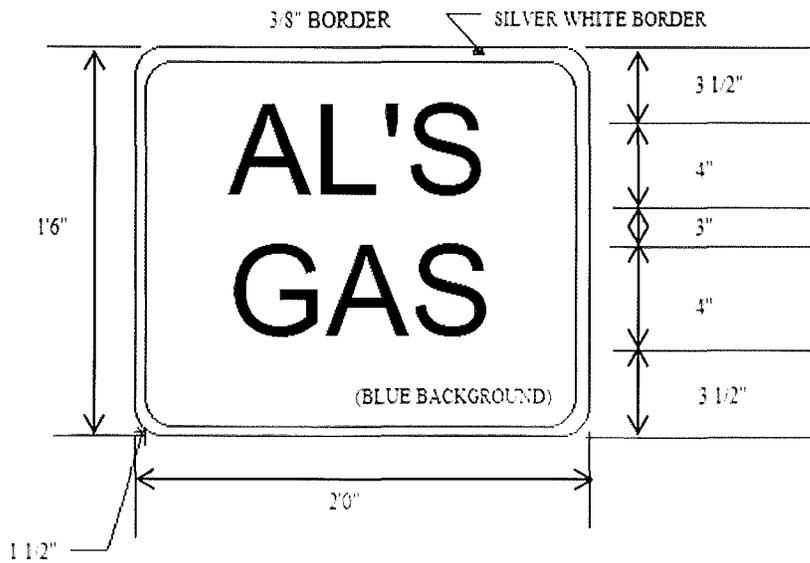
TYPICAL EXIT RAMP LOGO SIGN DETAIL
